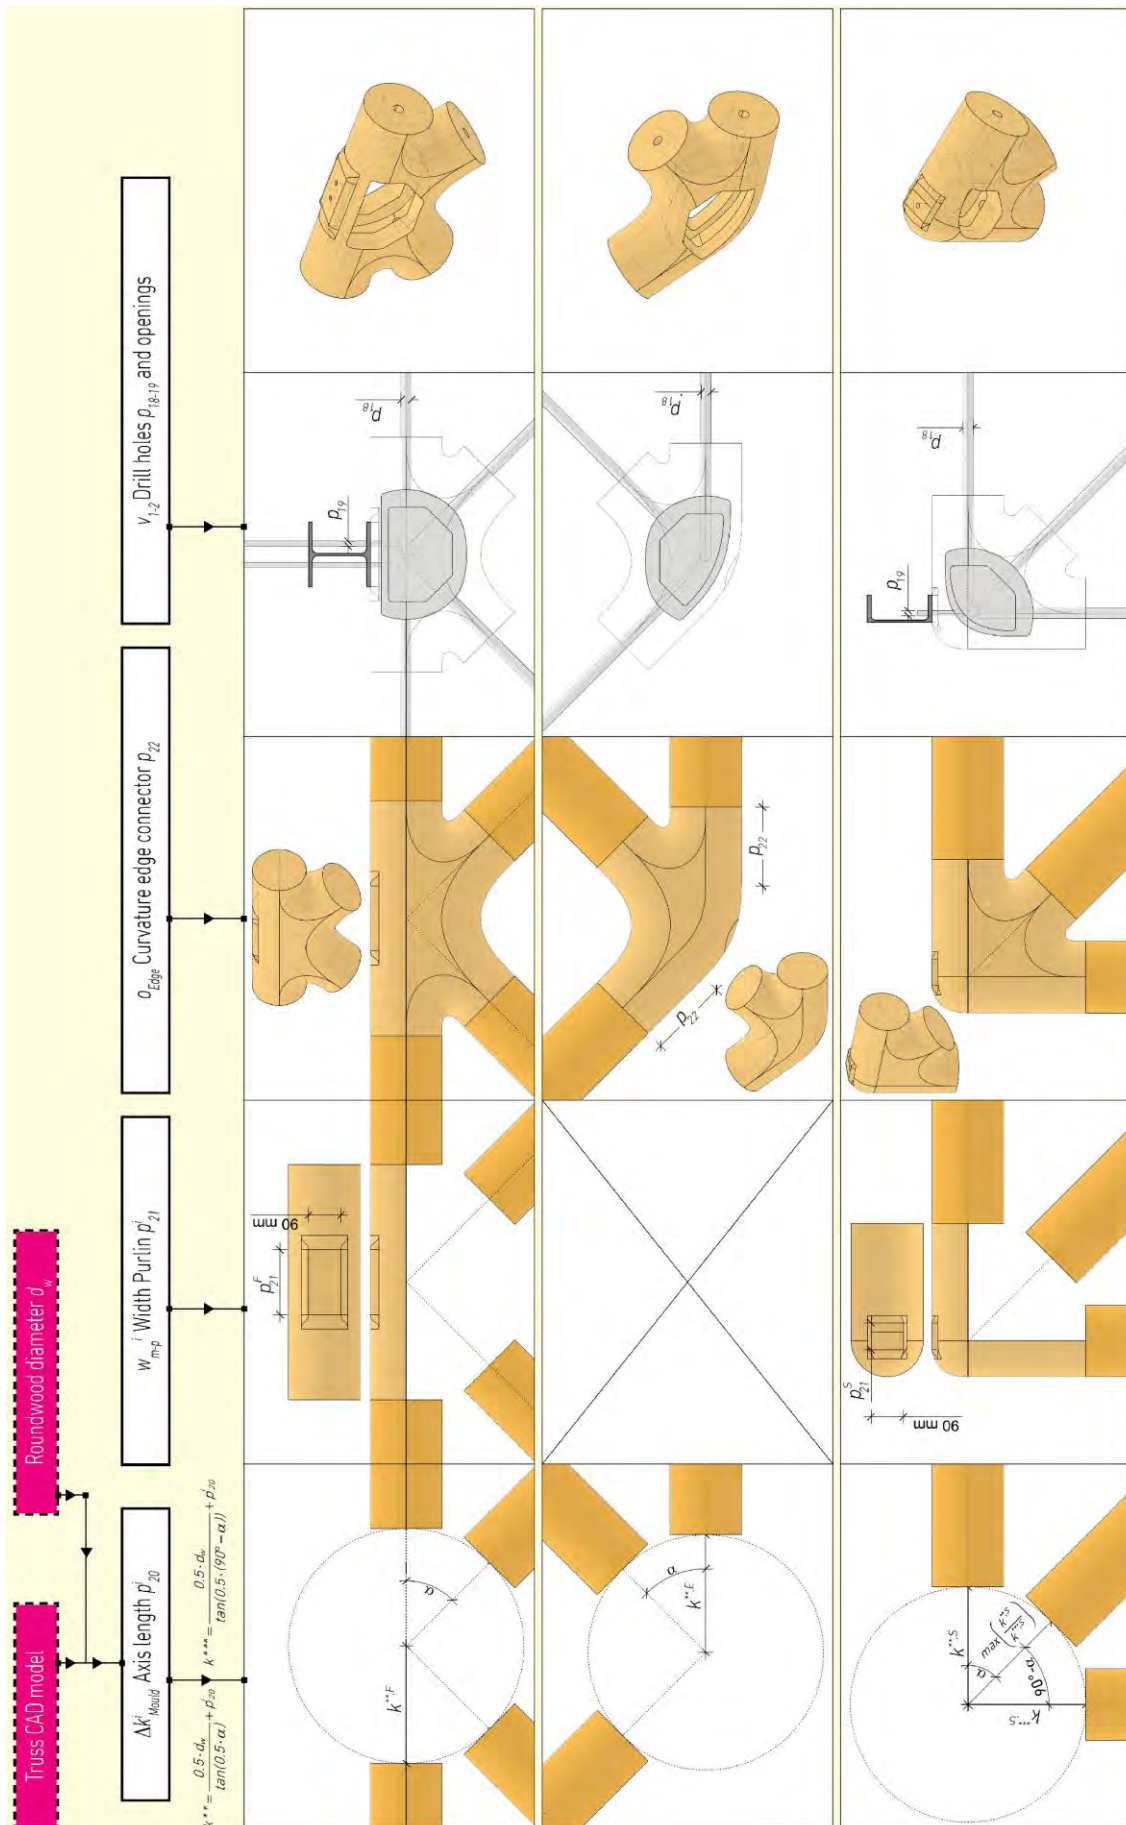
Design algorithm module 3 - Outer moulded joint design
